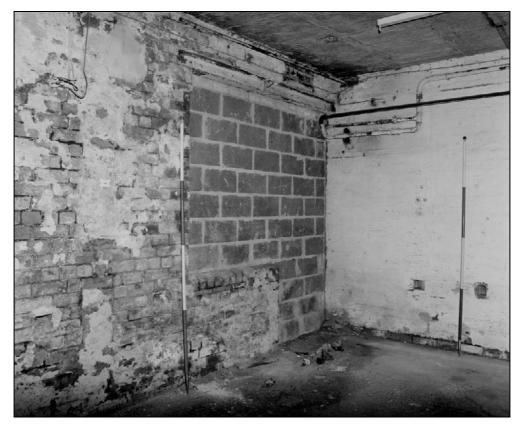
Detail of blocked doorway and type 19/20 window, west wall of G5(film 15.1)
